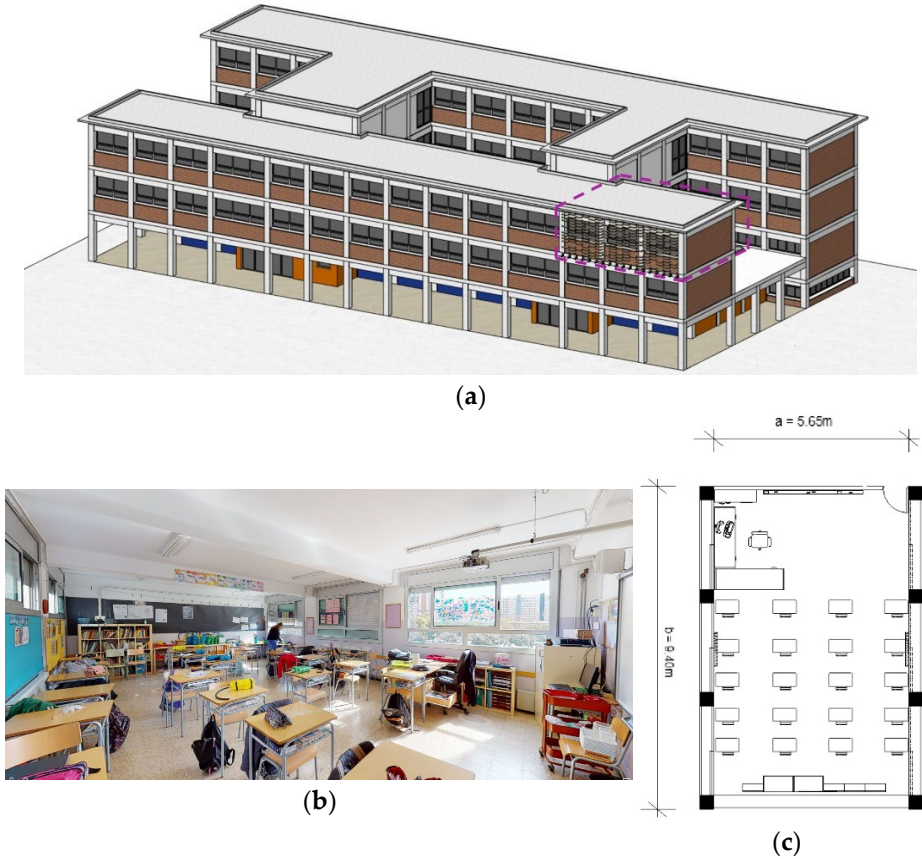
Studied classroom location in the school (a), interior view (b) and a floor plan (c).
